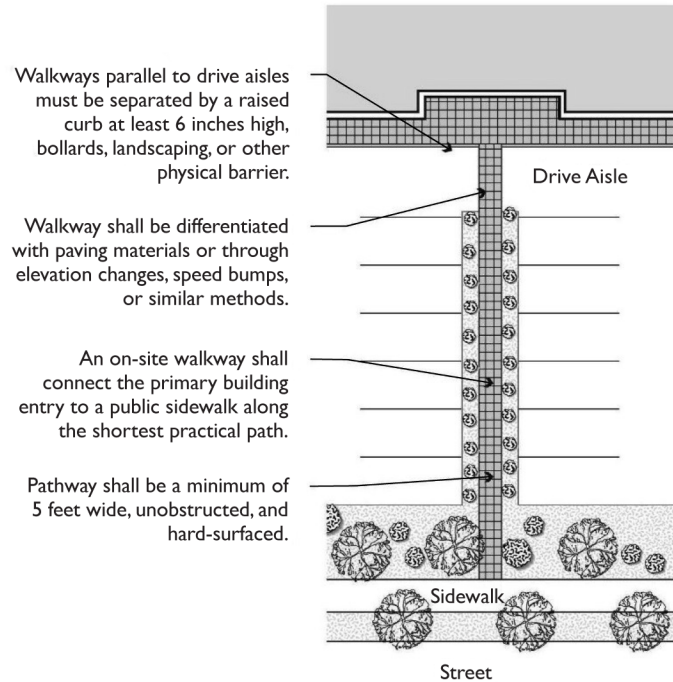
A(1): PEDESTRIAN ACCESS THROUGH PARKING AREA
